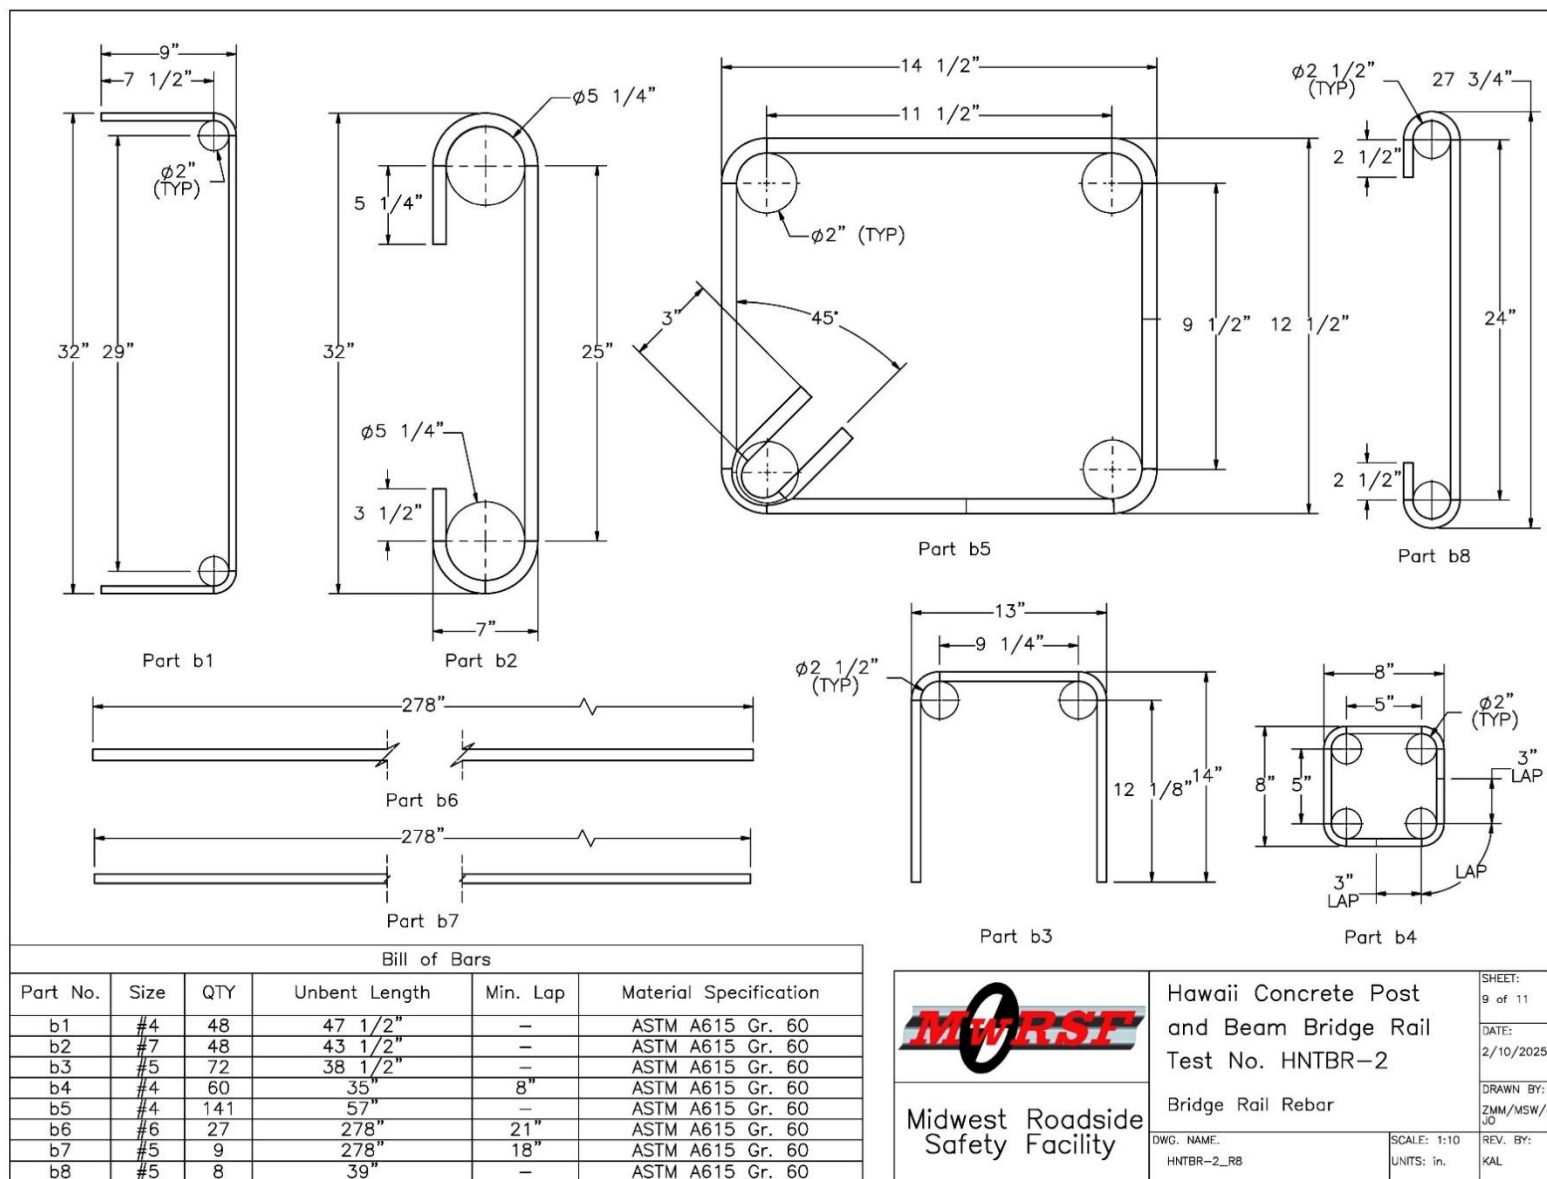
Rebar Details, Test Nos. HNTBR-2 and HNTBR-3
